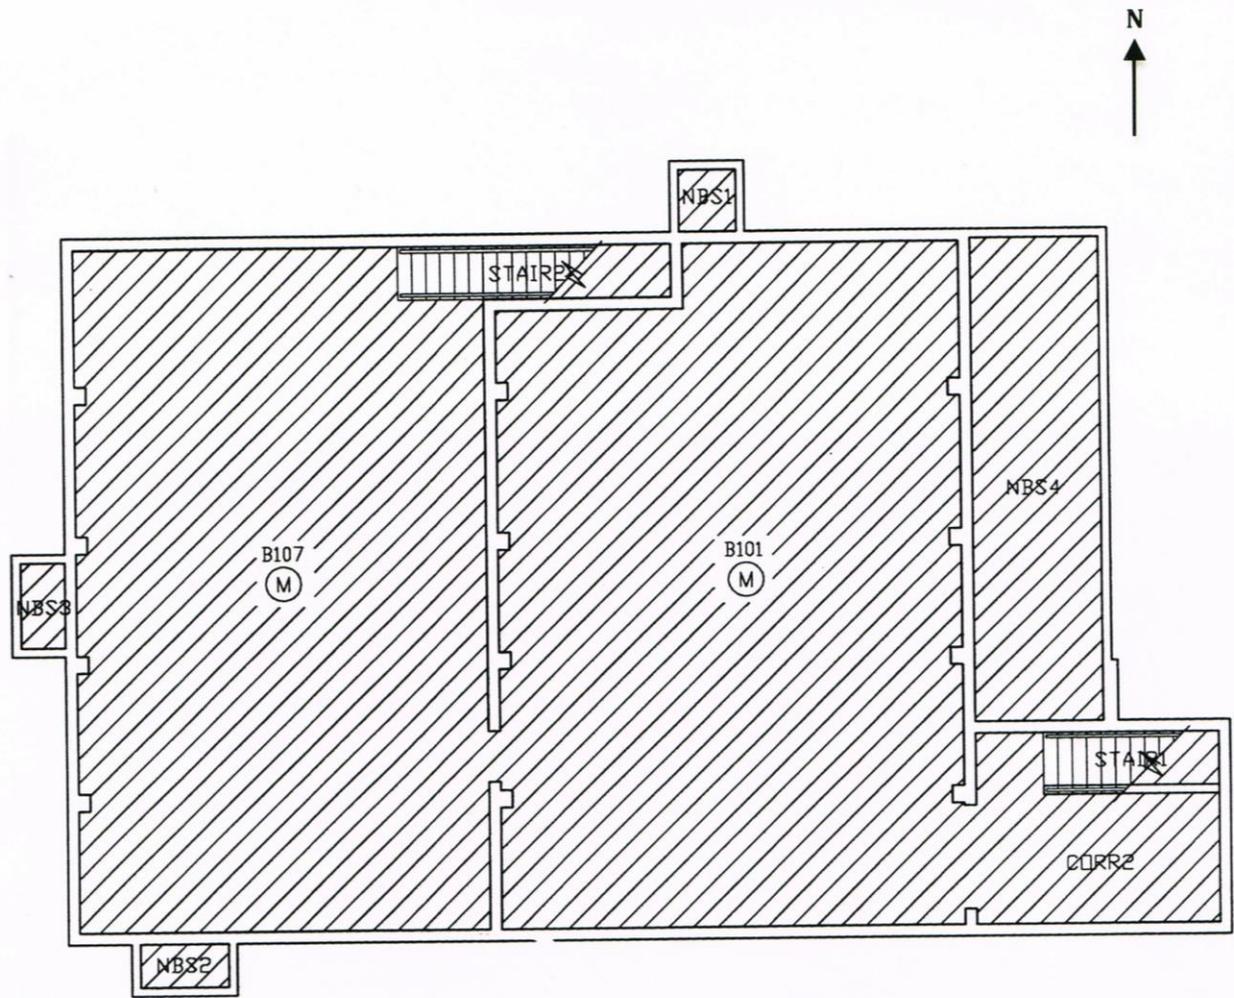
Office Building 827A - Basement, Facility Key Plan, 1996. LLNL Archives (PKS96-827A-002B)
